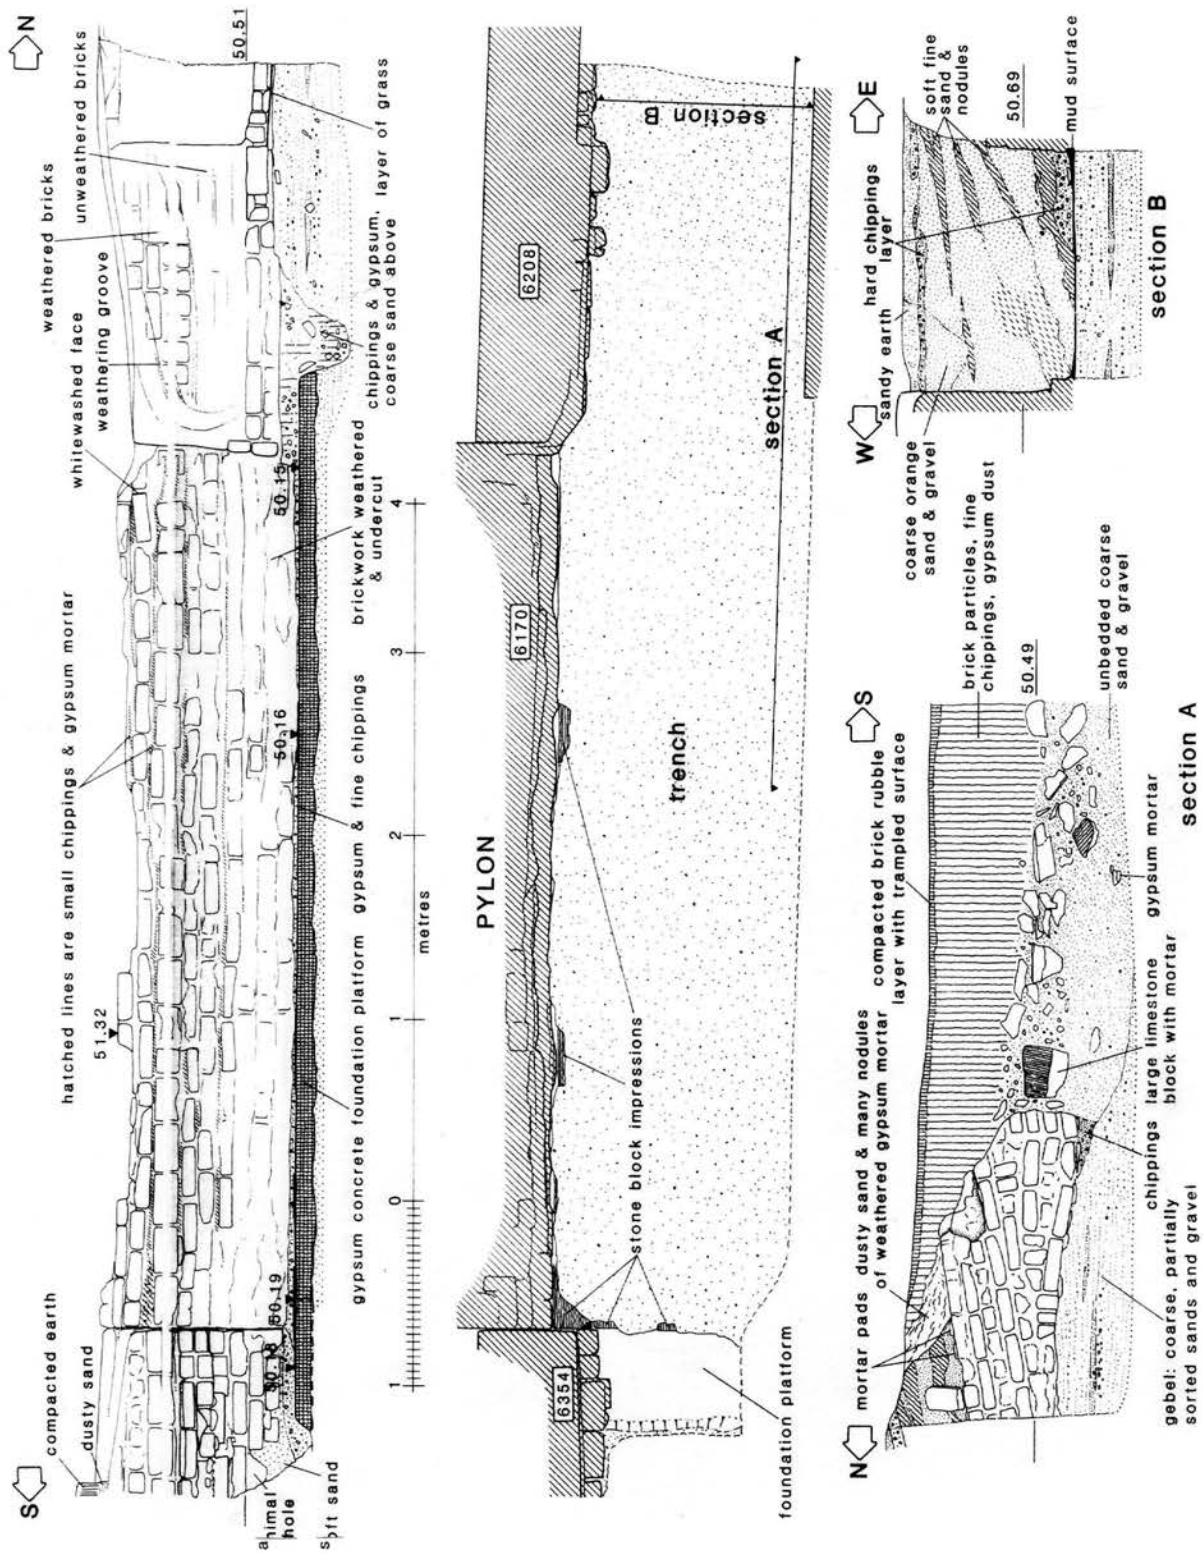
Elevation, plan, and sections of the trench in the pylon gateway.
